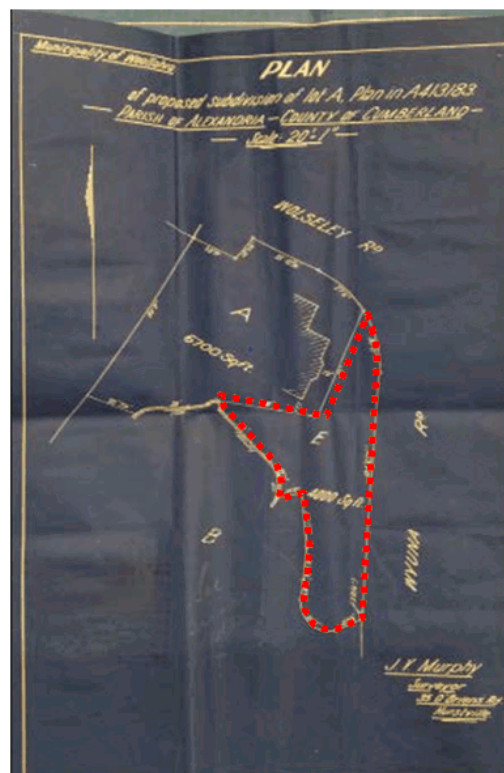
'Plan of proposed subdivision of lot A' Subdivision No: 1508, with subject site shown dotted. (Source: WMC Subdivision Plans - Woollahra Local History Collection MS135 Box 14. Annotation: WMC Officer.)
